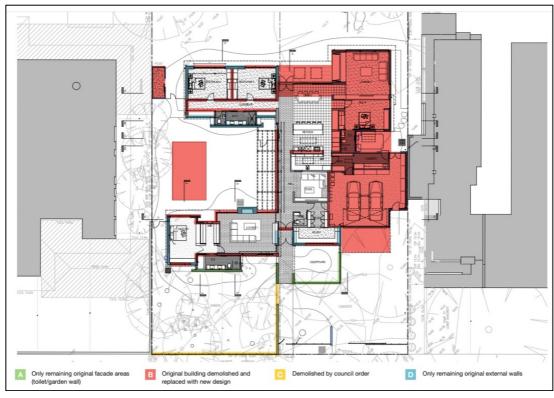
Site plan demonstrating the original design intent, versus what exists today (plan provided by the owners).
